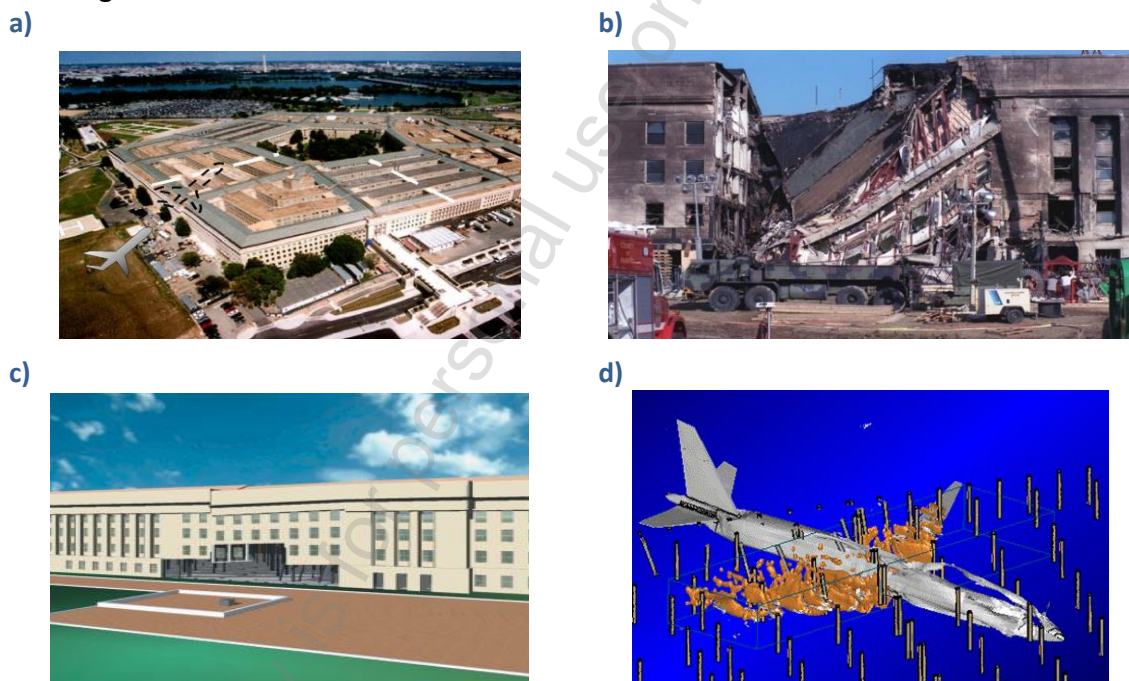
Terrorist attack on the Pentagon building, Washington: a) location and angle of impact; b) collapse after the strike, c) place of impact before collapsing d) idealisation of the strike into the columns
